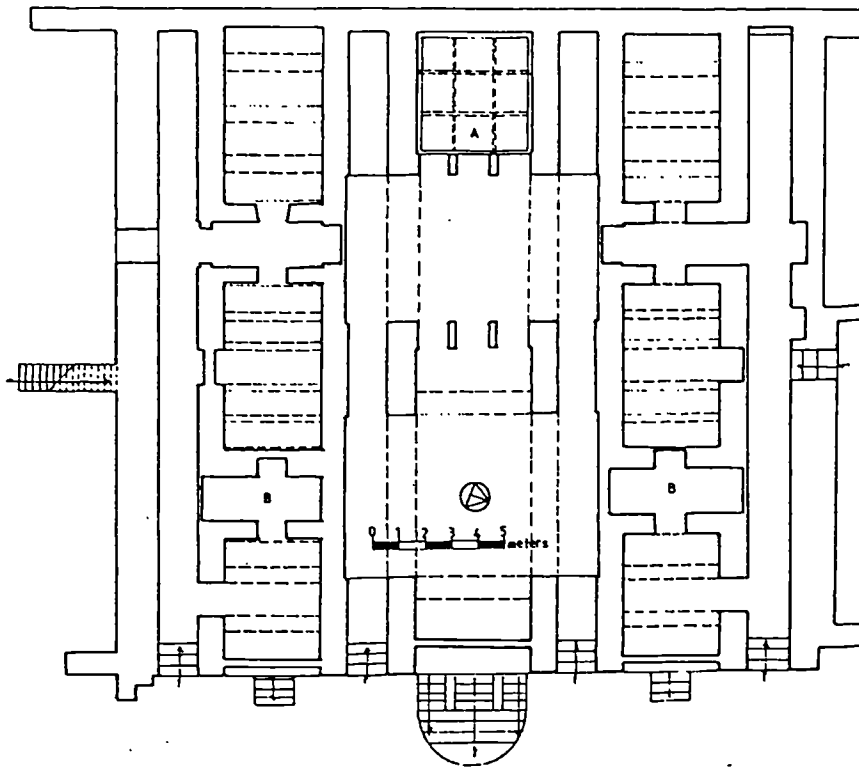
First floor plan of the Harem (house E) at the Bagh-e Dowlatabad. (Ancient Monuments Department of Iran).
